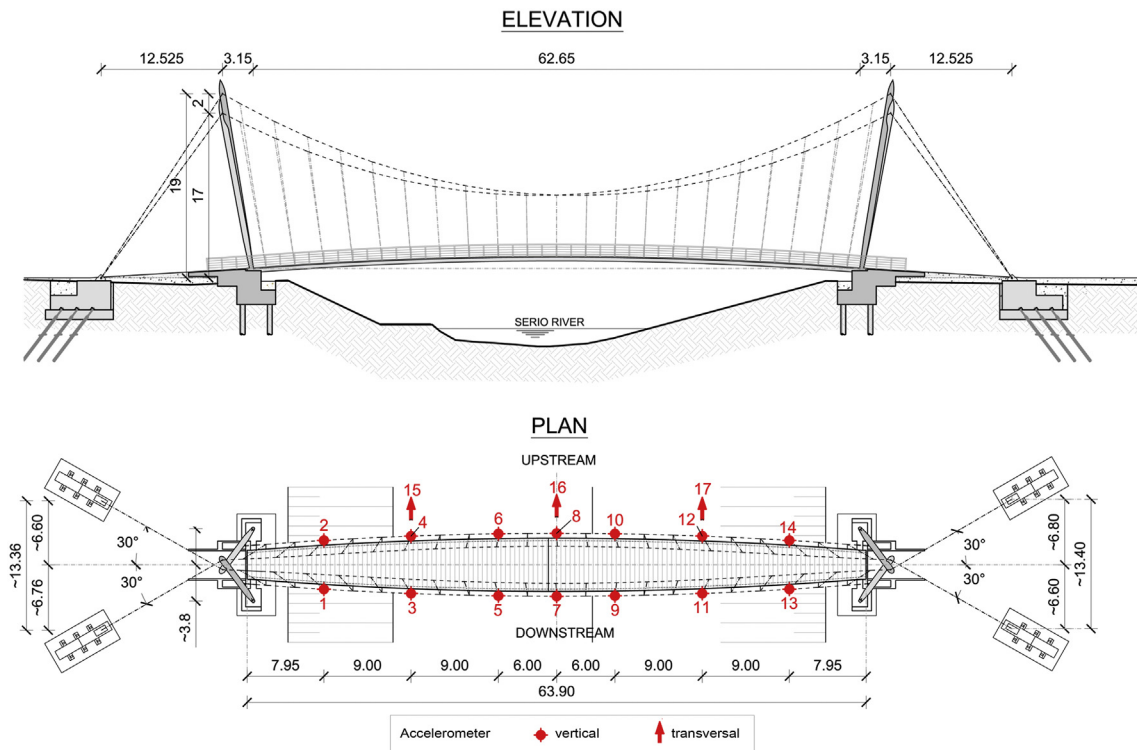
Elevation and plan of the footbridge (dimensions in m). Accelerometer layout during the field tests.
